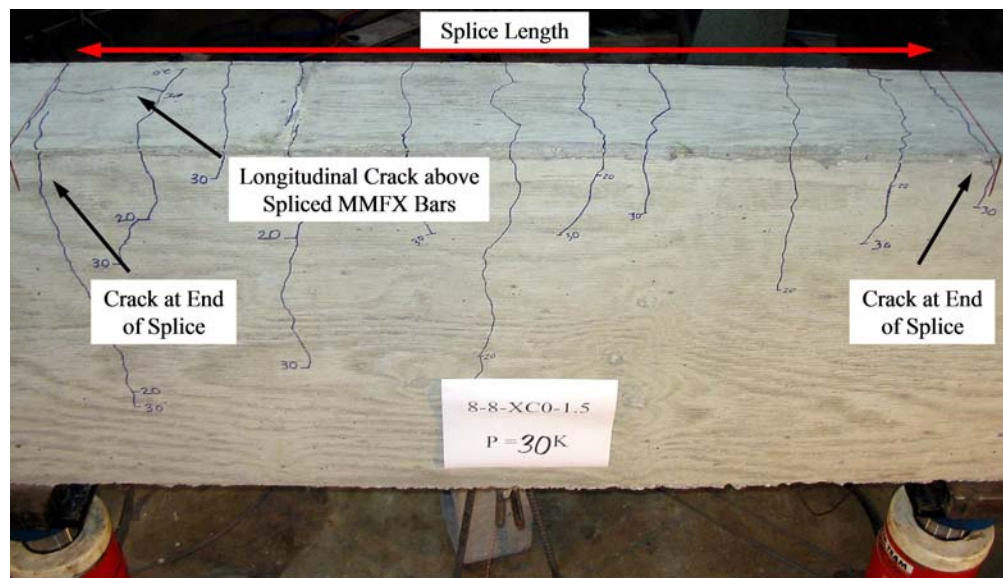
Cracking of typical unconfined splice at onset of longitudinal splitting
